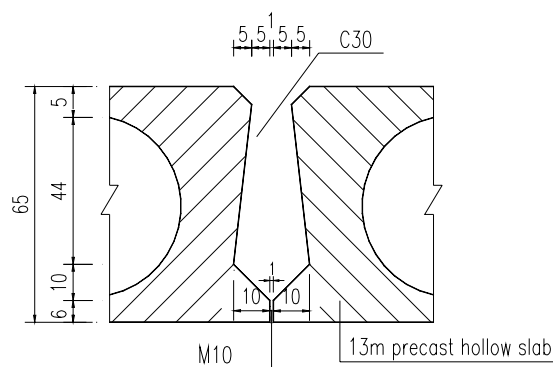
Sectional dimensions of 13 m middle and side slabs (cm).
